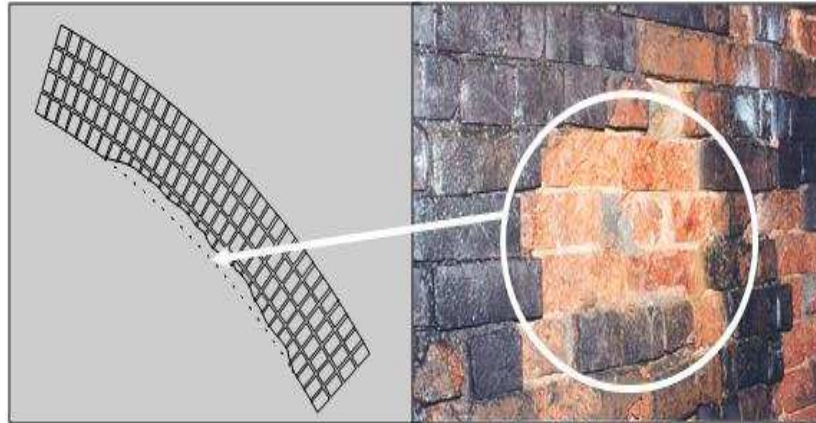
The phenomenon of spalling (Courtesy of Network Rail Ltd.)
